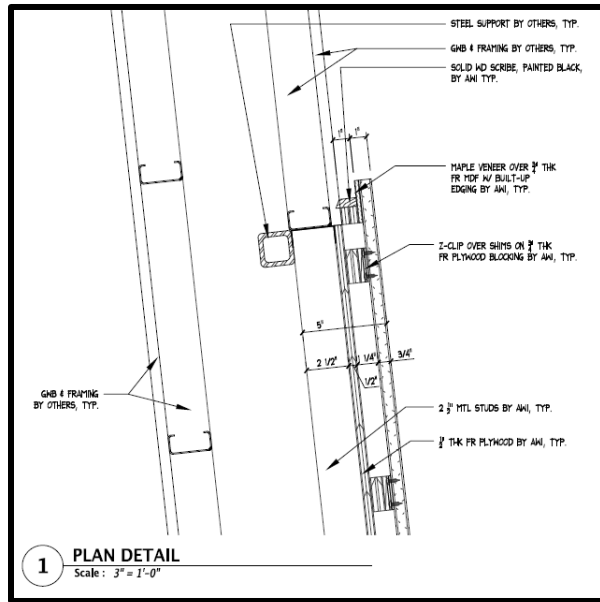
Detail of Architectural Screen Wall showing how the Screen Wall is attached to Stud Framing
